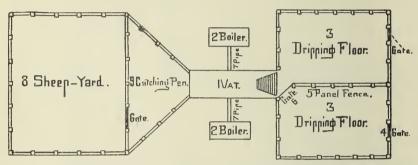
Ground plan of yards and vat. (Copied from Powers' The American Merino, 1887, p. 304.)
